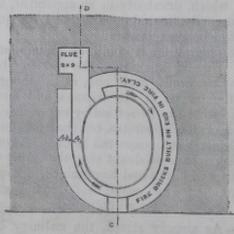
Details showing the Setting of a 25 Gallon Boiler.
